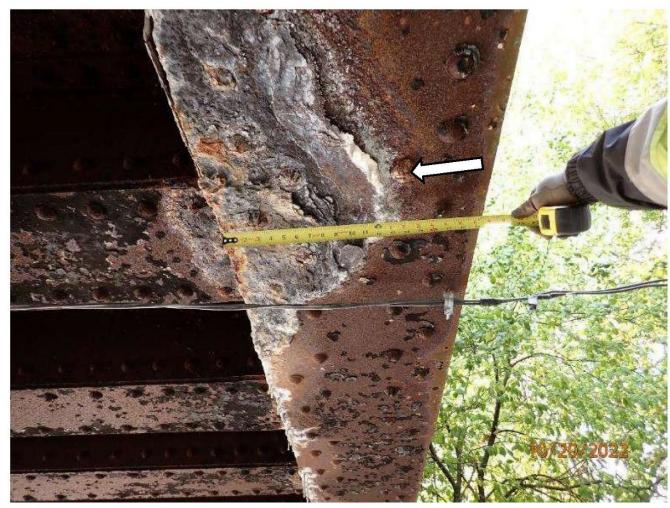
Corrosion on north girder over southbound lane, looking west
